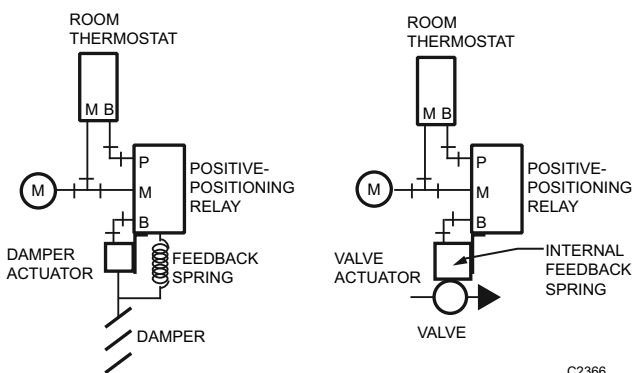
Positive-Positioning Relay with Damper and Valve Actuators.
